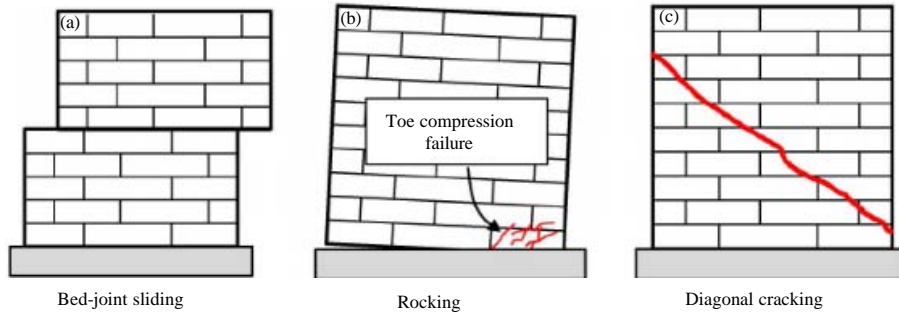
Failure modes in unreinforced masonry walls: a) Bed-joint sliding; b) Rocking and toe compression and c) Stair-stepped diagonal and diagonal cracking (Ghiassi *et al.*, 2011)
